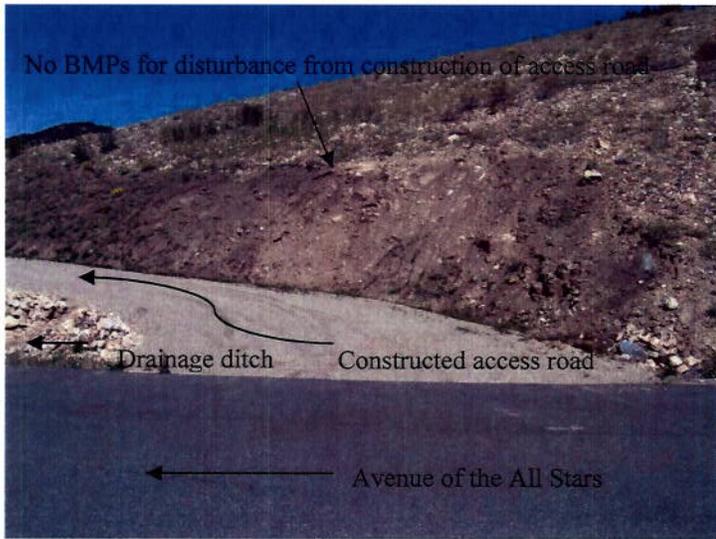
Constructed water tank access road, north of Avenue of the All Stars
